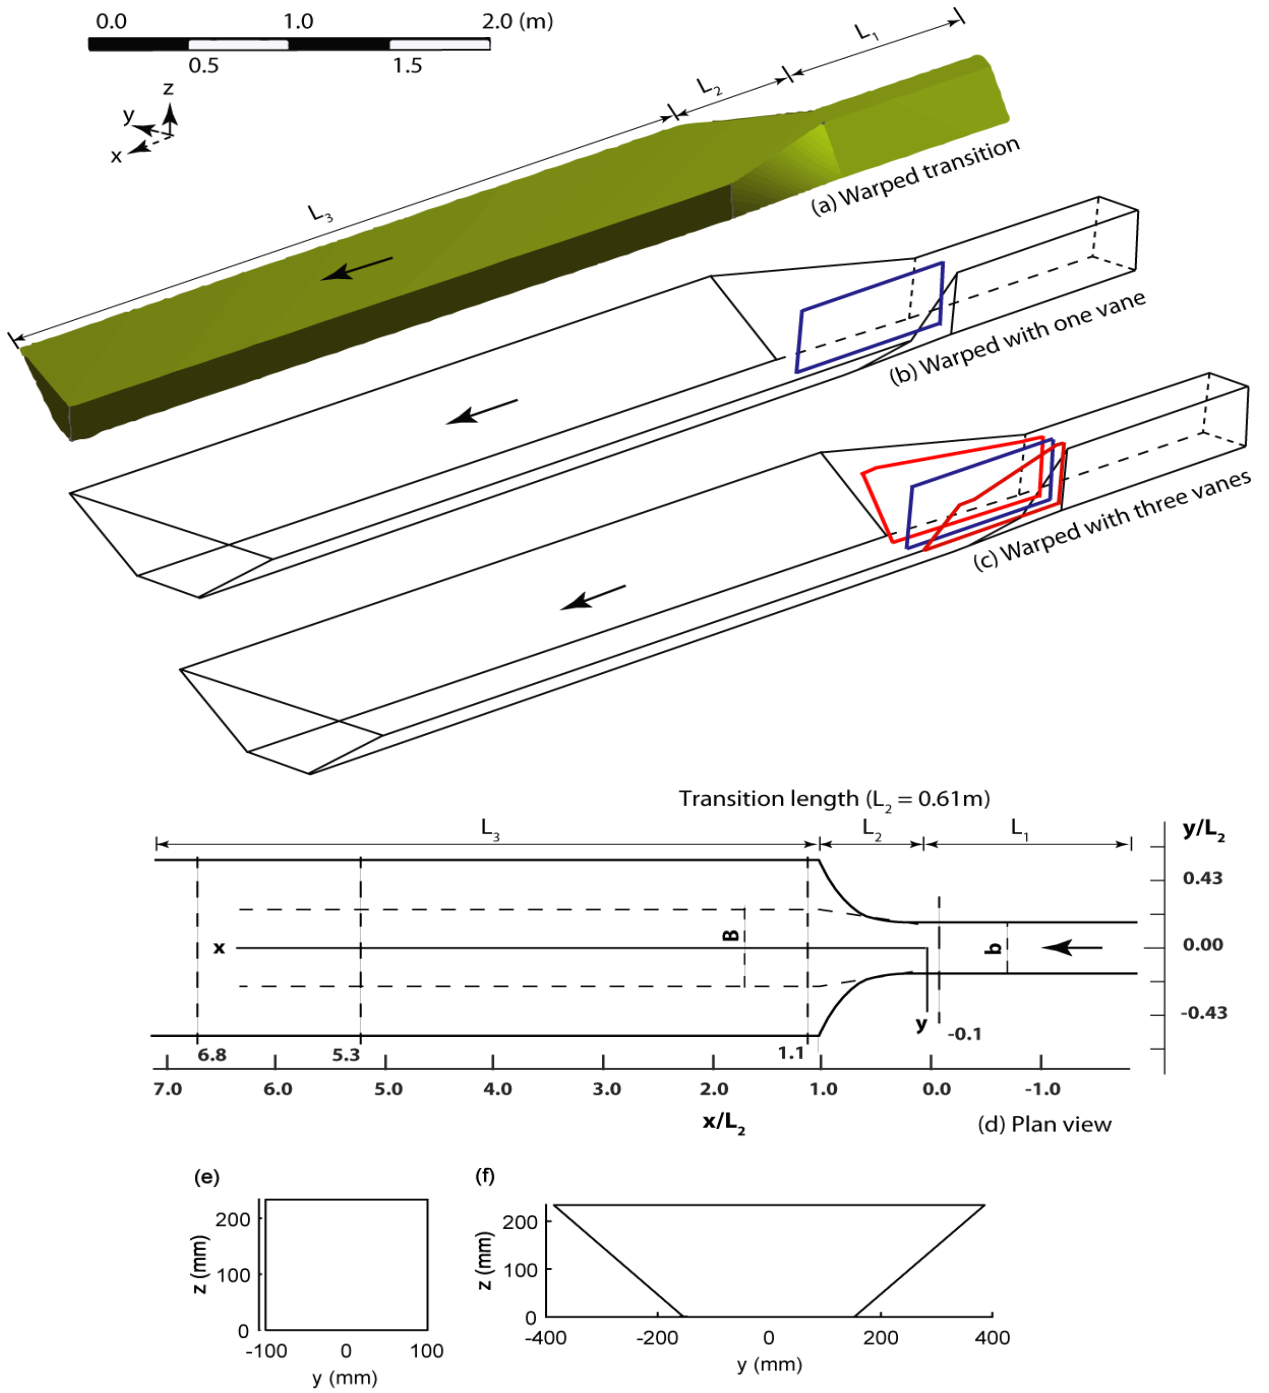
3-D geometry, plan of channel and two sections (rectangular and trapezoidal), showing warped transition with one-vane and three-vanes.
